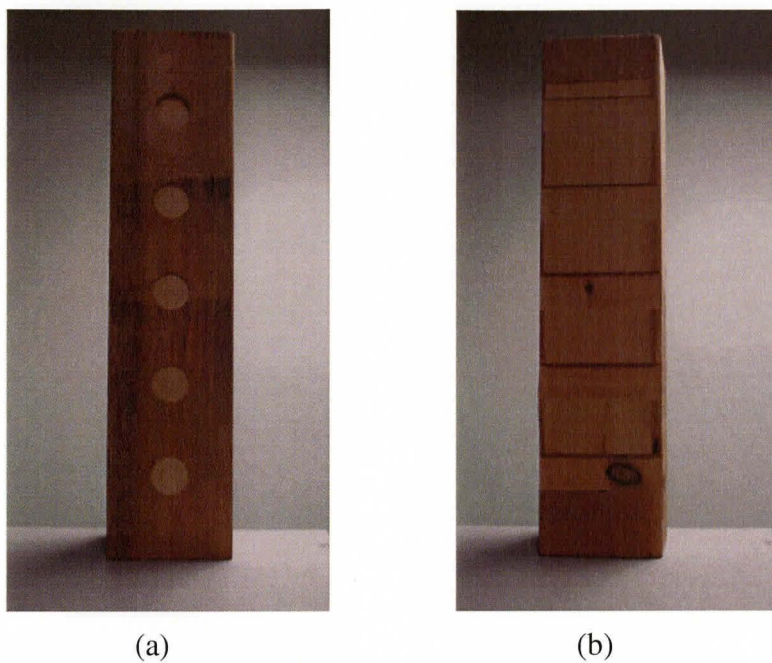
The specimen with the pre-fabricated defects, (a) Face A, and (b) Face B
